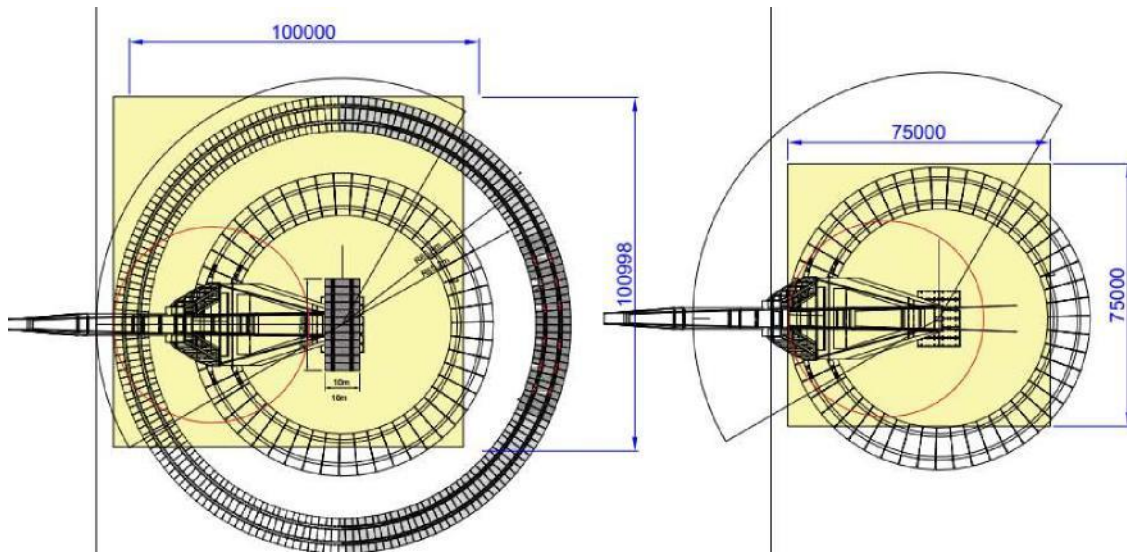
Ring Crane footprint with SK6000 (left) and without SK6000 (right)
